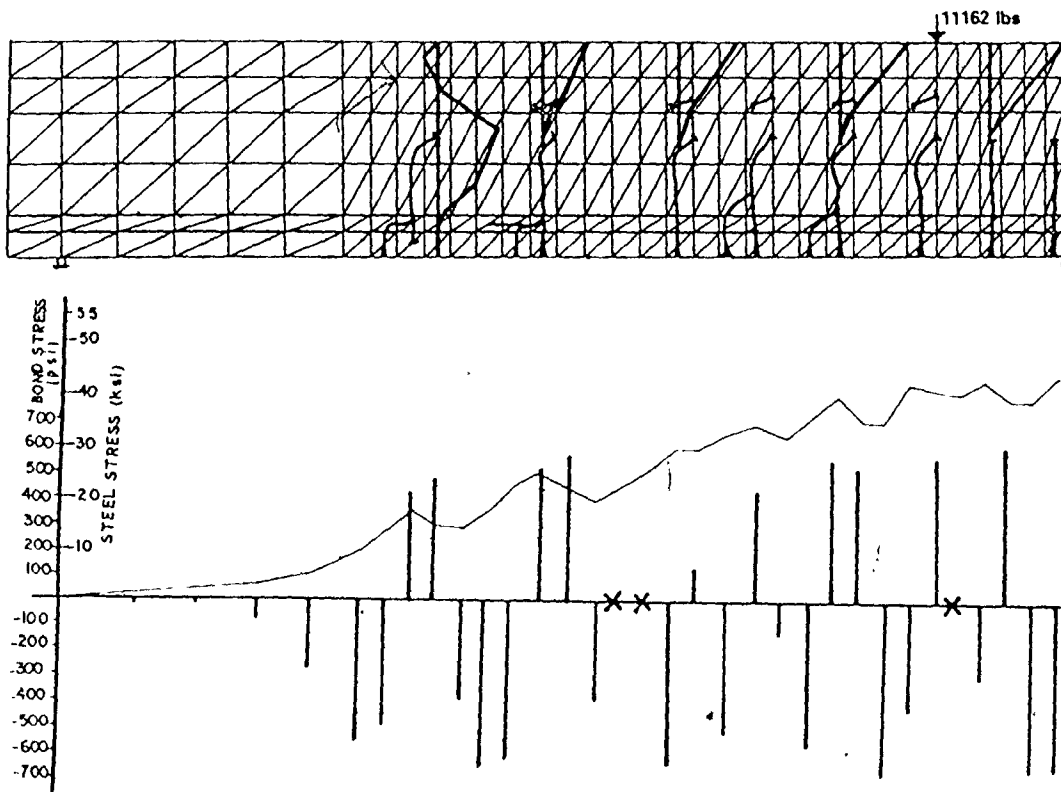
32 DETAILS OF CRACK PROPAGATION AND CONCRETE, STEEL AND BOND STRESS DISTRIBUTIONS FOR BEAM(7/1)
